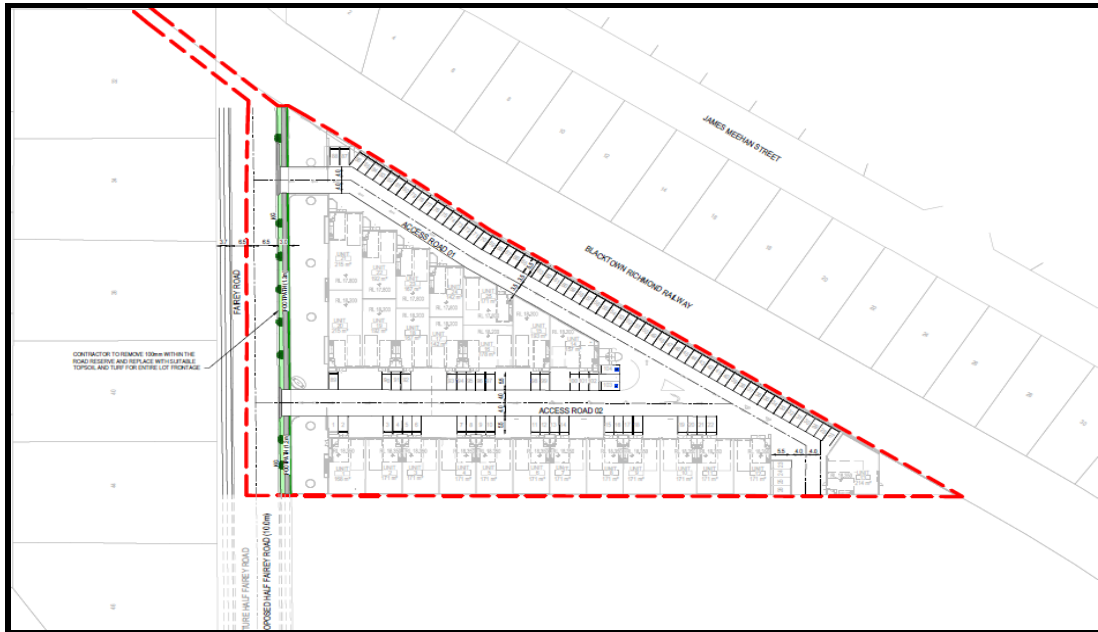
Site Layout of Proposed Development – No. 54 Fairey Road, South Windsor
